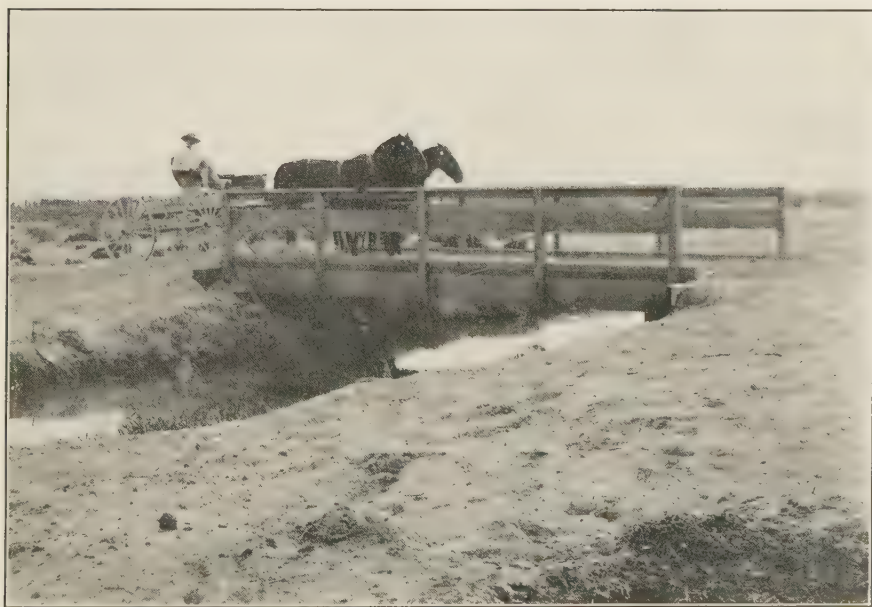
FIG. B.—Wooden stringer bridge. Truckee-Carson Project, Nev.
